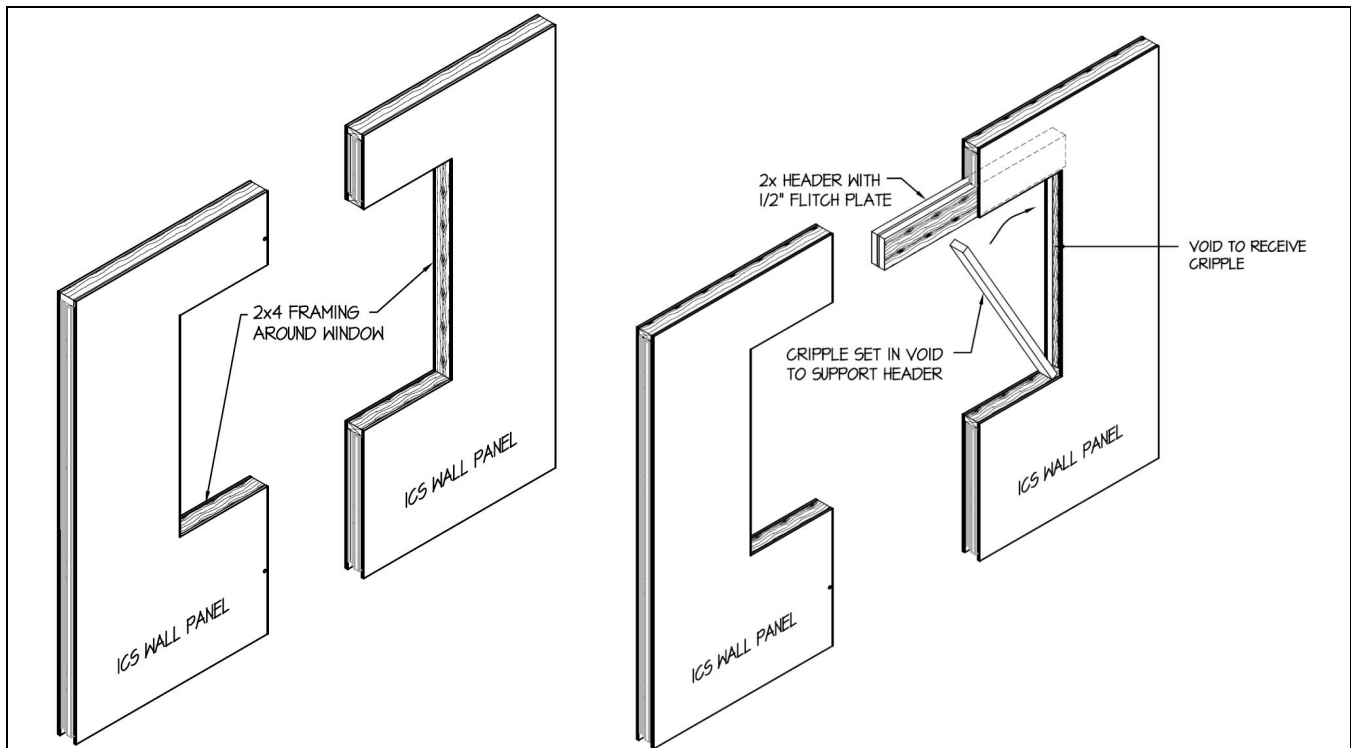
Rough Opening for Window: The perimeters of window openings are routed-out 1½" and 2" x 4"s installed. The sill and header should overlap side members, as shown.
